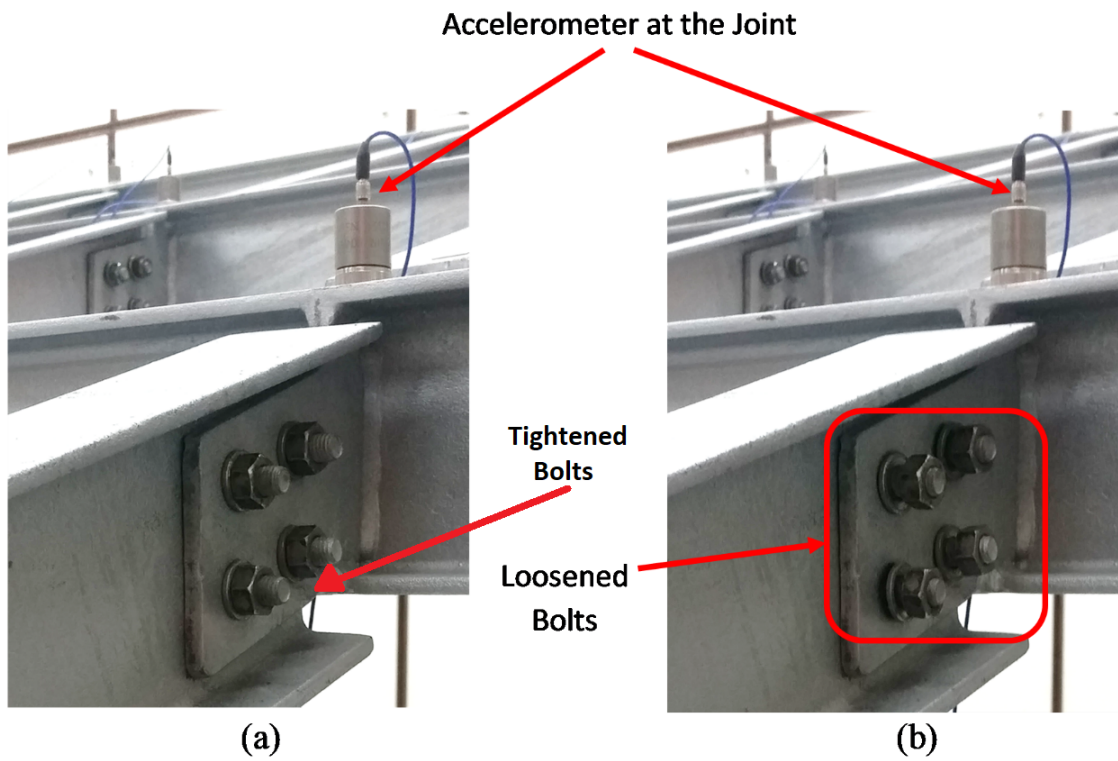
Undamaged and damaged state of the girder and beam joint in QUGS (Abdeljaber et al. 2017).
